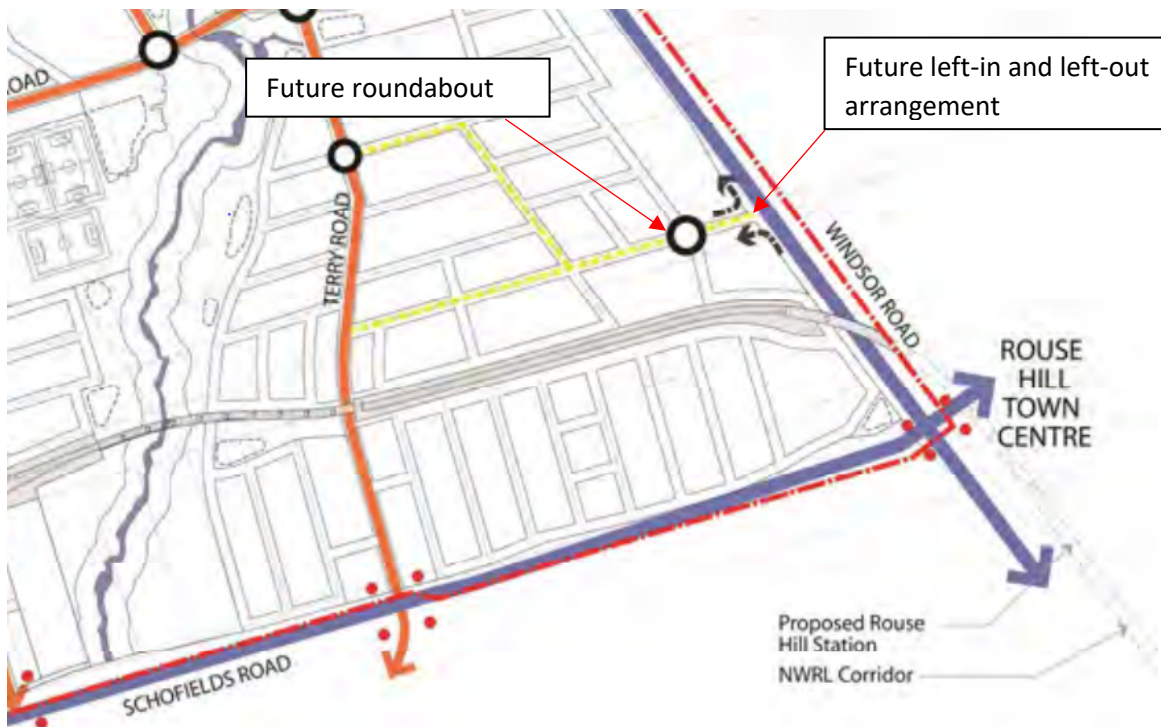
Cudgegong Road Station (Area 20) Precinct Road Hierarchy Plan (source: NSW Department of Planning and Environment [website](#))
